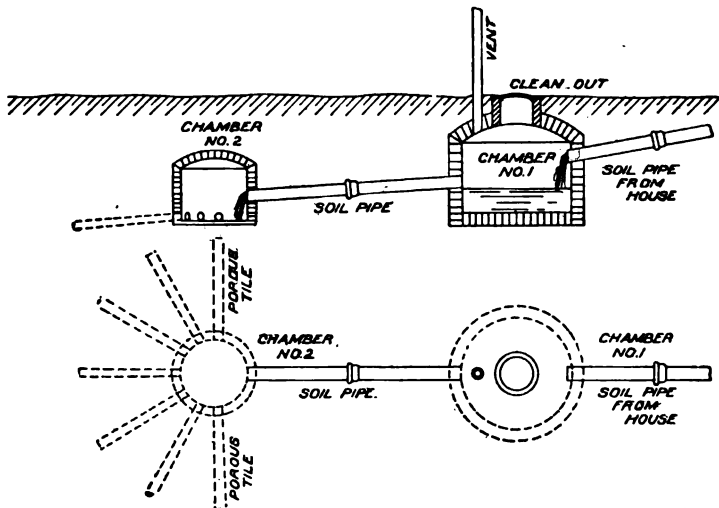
Sectional Elevation and Plan of Cesspool for Septic Treatment of Sewage.
